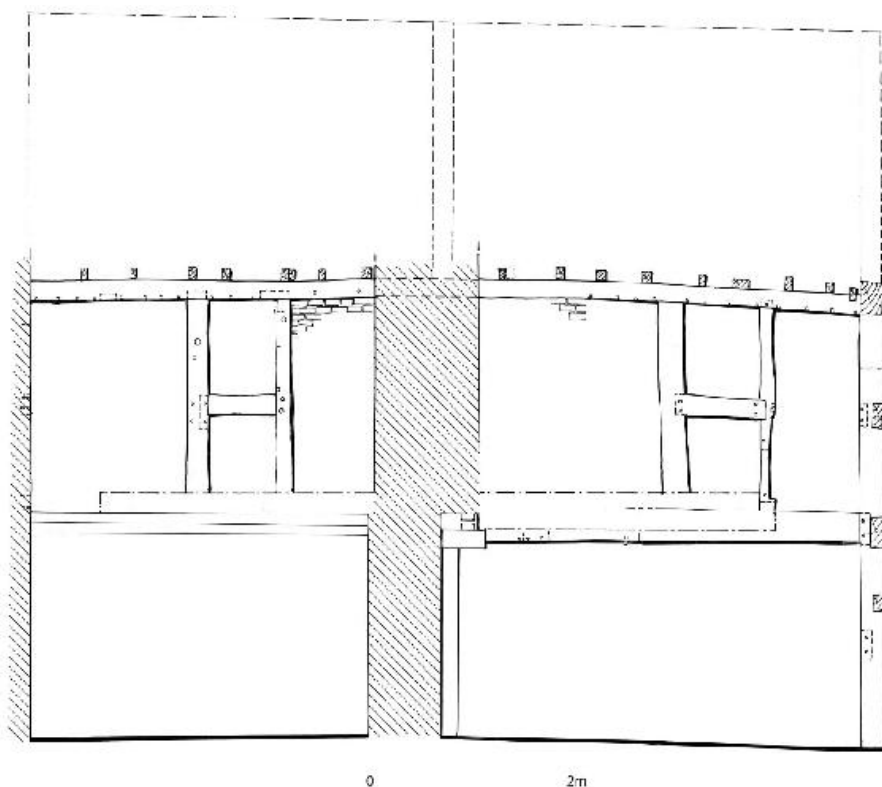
Survey of the inner face of the surviving timber-framing of the street side of 64-66 Widemarsh Street
